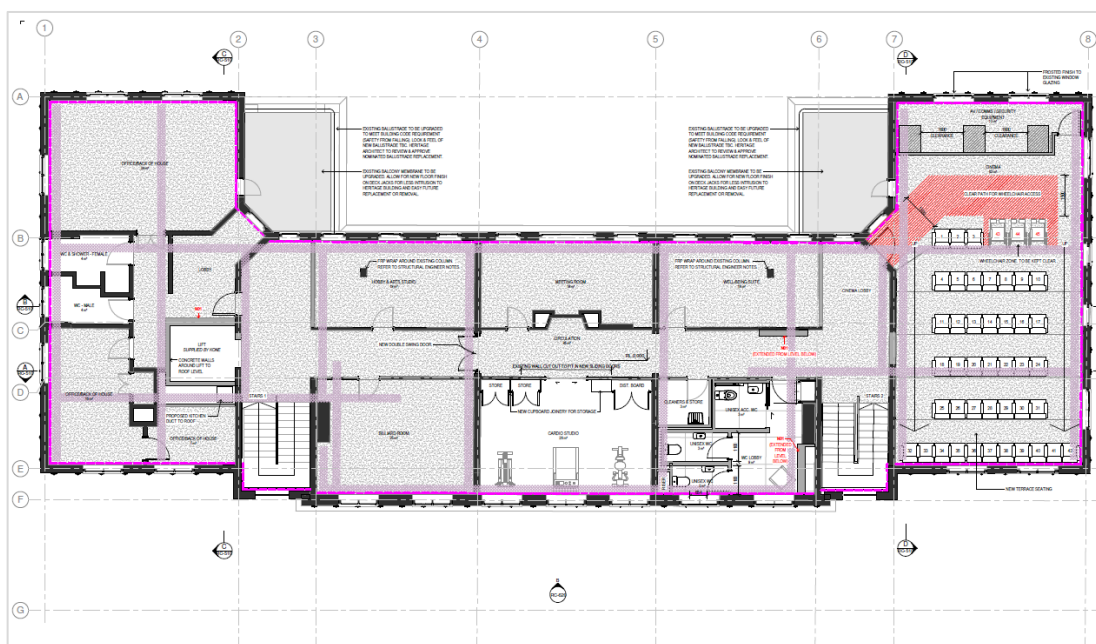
Approved Level 1 Floor Plan for Pearson House alterations approved 11/08/2022.
